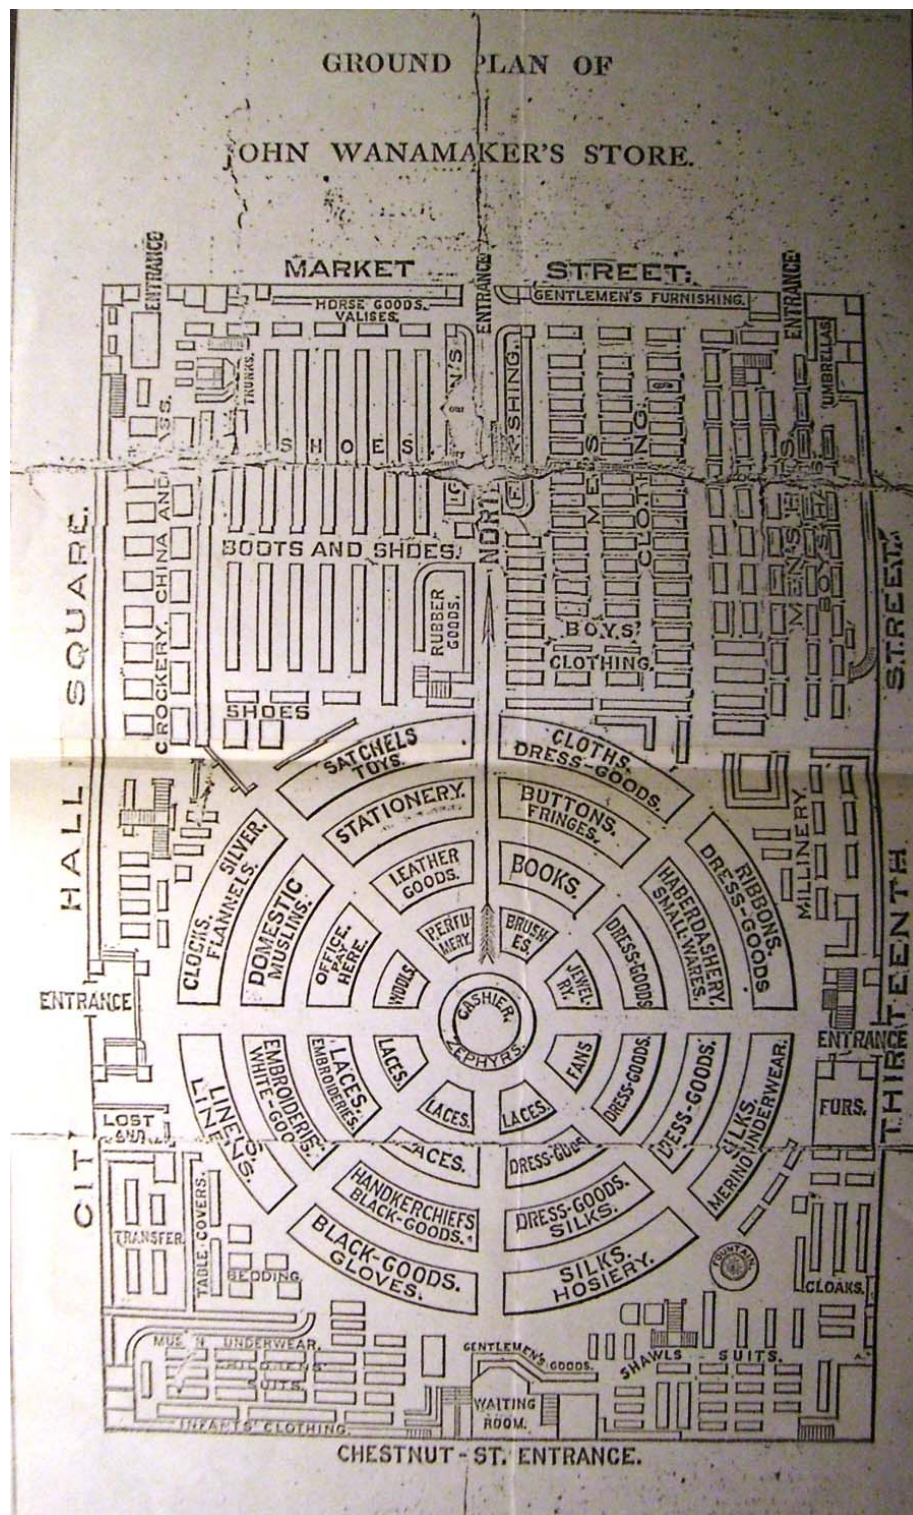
Ground floor layout, John Wanamaker Grand Depot, circa 1877
